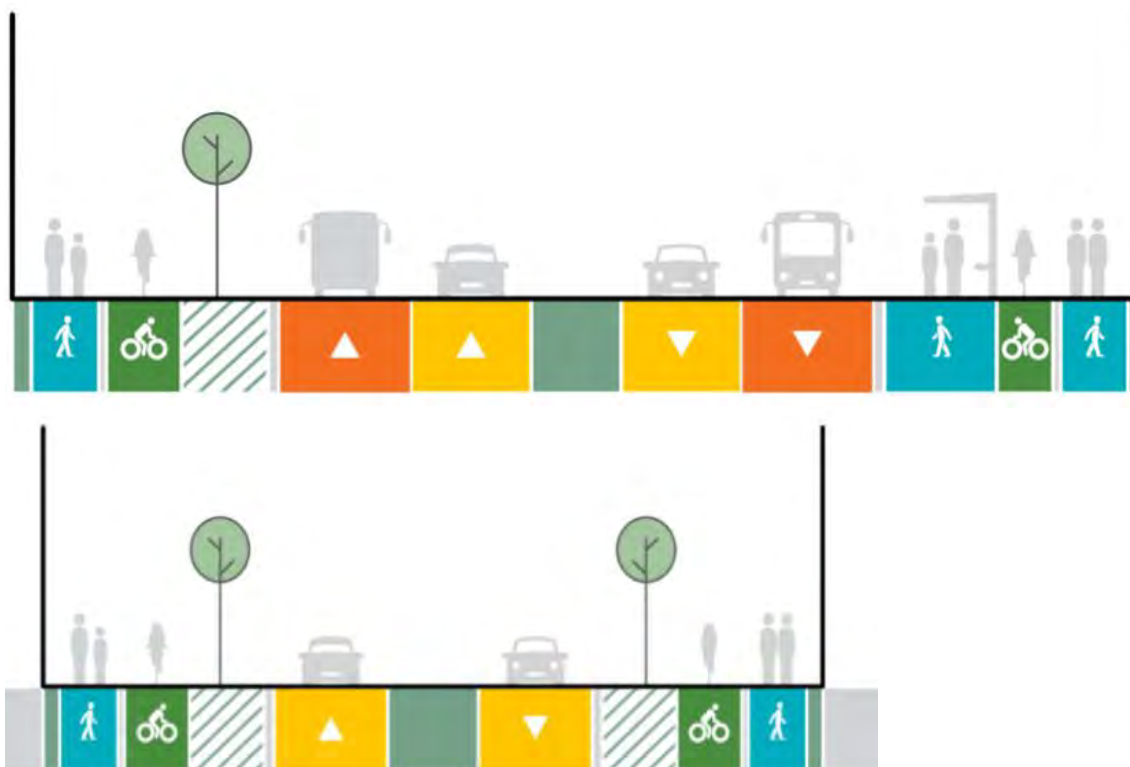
Hobsonville Road FTN Upgrade Typical Cross Sections (typical 30m and typical 24m)
